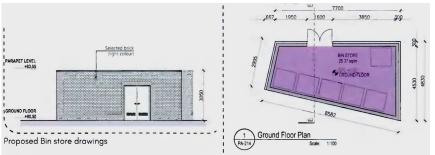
PROPOSED PERMANENT 25.37SQ.M BIN STORE ADJOINING THE OLD GREENHILLS ROAD
